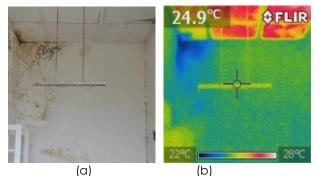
A wall in the left room at ground floor: (a) visible; (b) infrared thermal image
